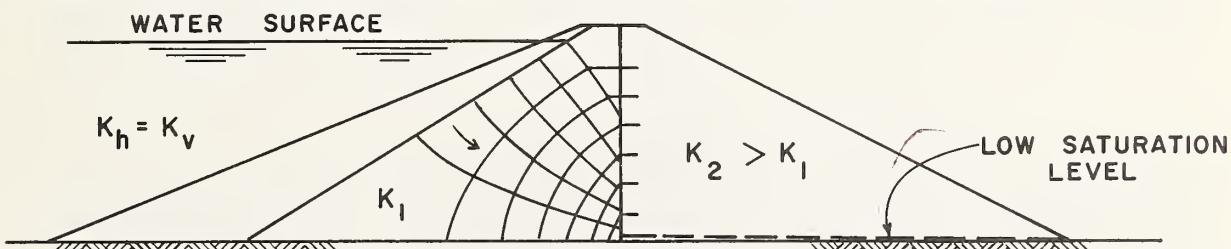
An ideal zoned-earth dam on an impervious foundation. Note low-saturation level in dam.
